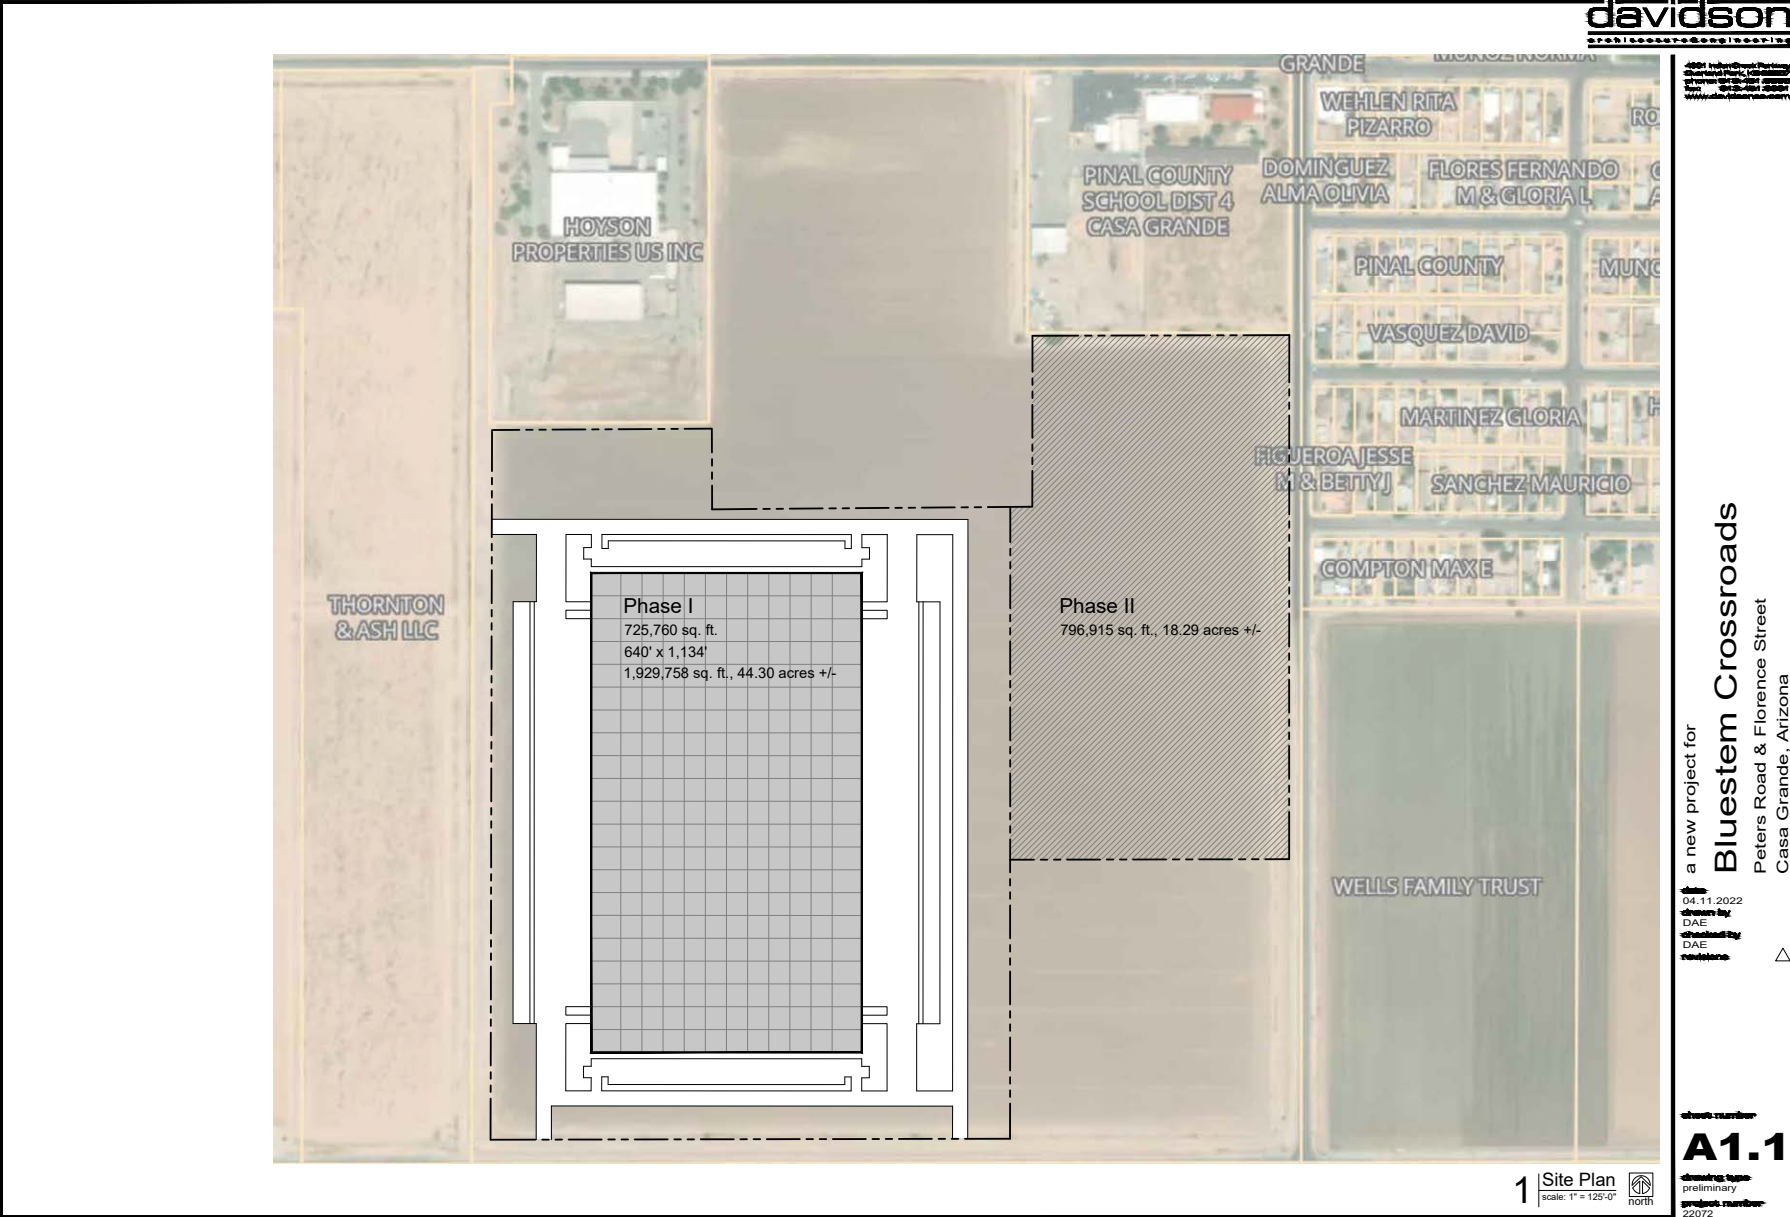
DETAIL | INDUSTRIAL LAND WITH APPROVED PLANS AVAILABLE
